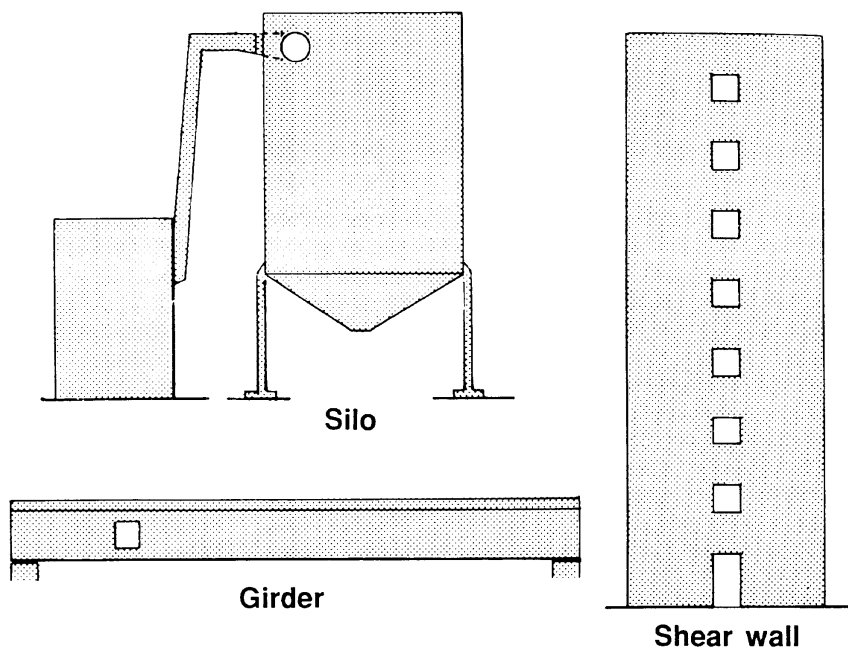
Examples of Perforated Elements in Reinforced Concrete Membrane Structures
